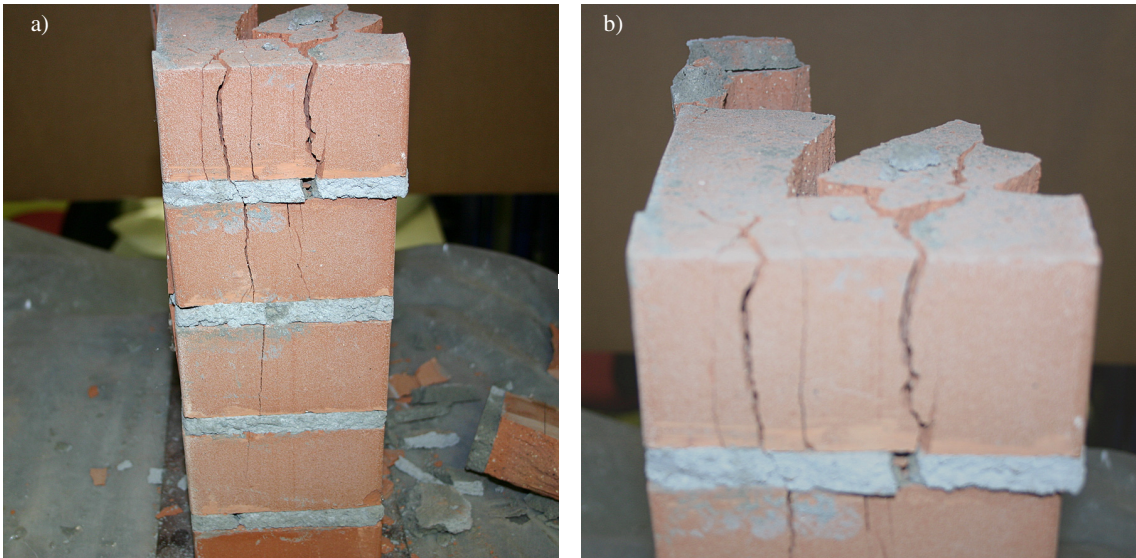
Compression tests on masonry wallettes: Fragmented bricks after failure.
